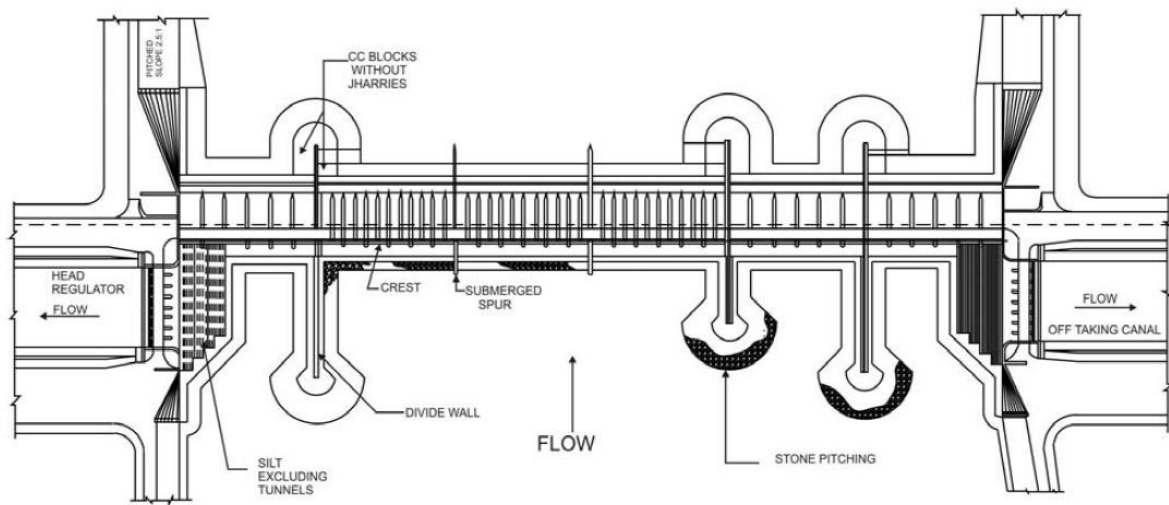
Typical Layout of a Barrage and its Appurtenant Structures
